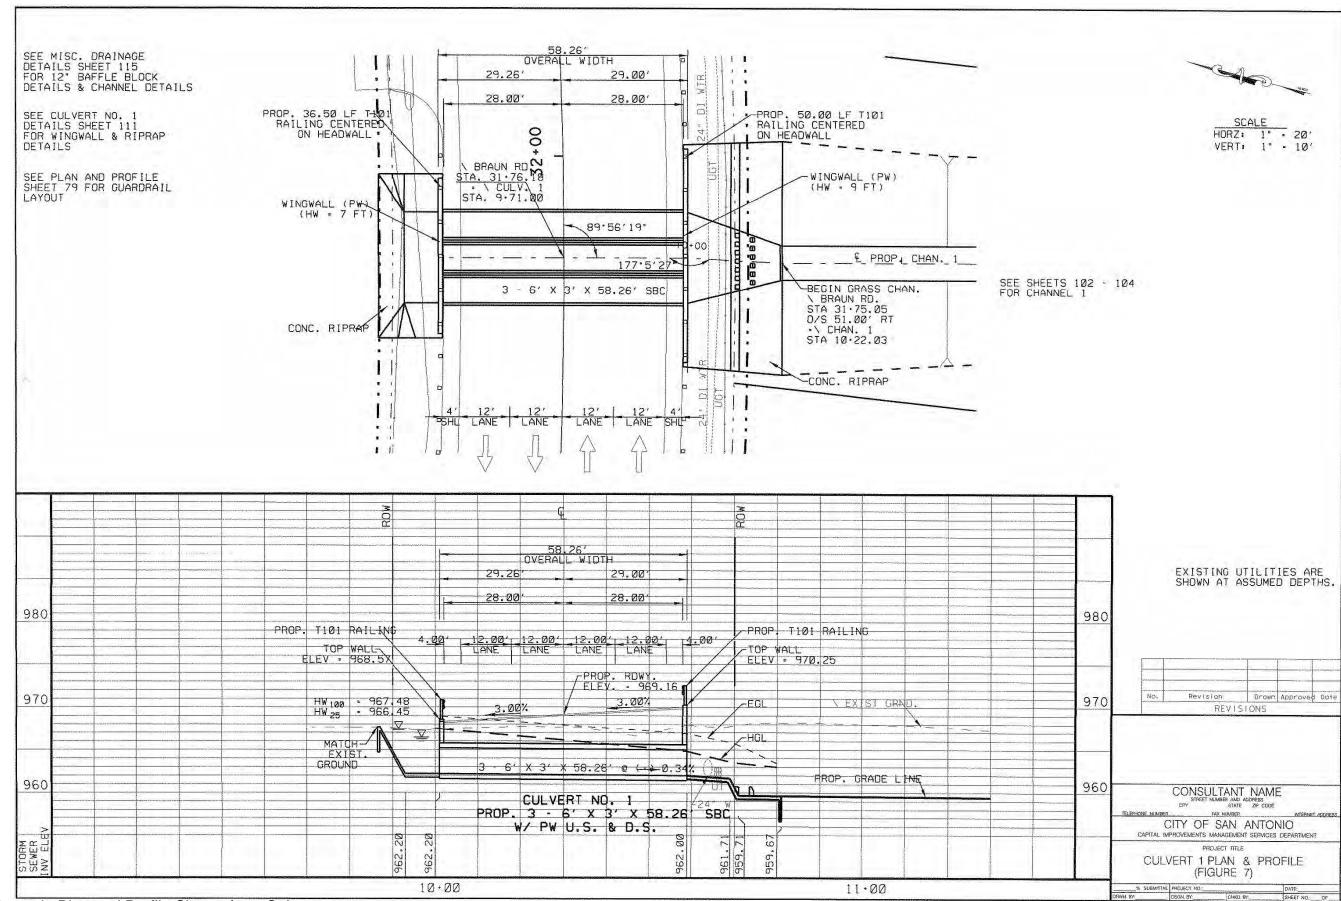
Example Plan and Profile Sheets for a Culvert
